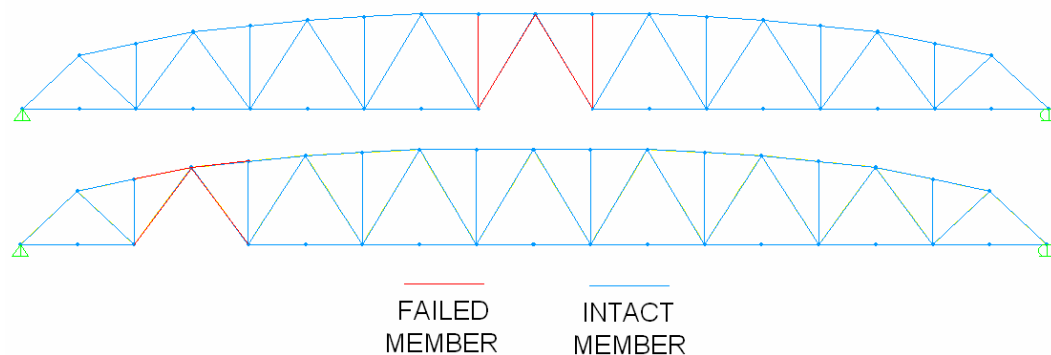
Truss Failures Due to Lack of Redundancy
